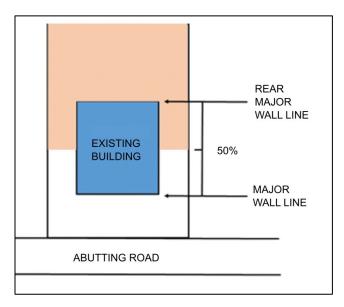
No permit is required for Alterations to, Additions to or construction of New Buildings that are not a dwelling with an eave height no greater than the existing located within the orange shaded area if the places is identified as Non-contributory.
